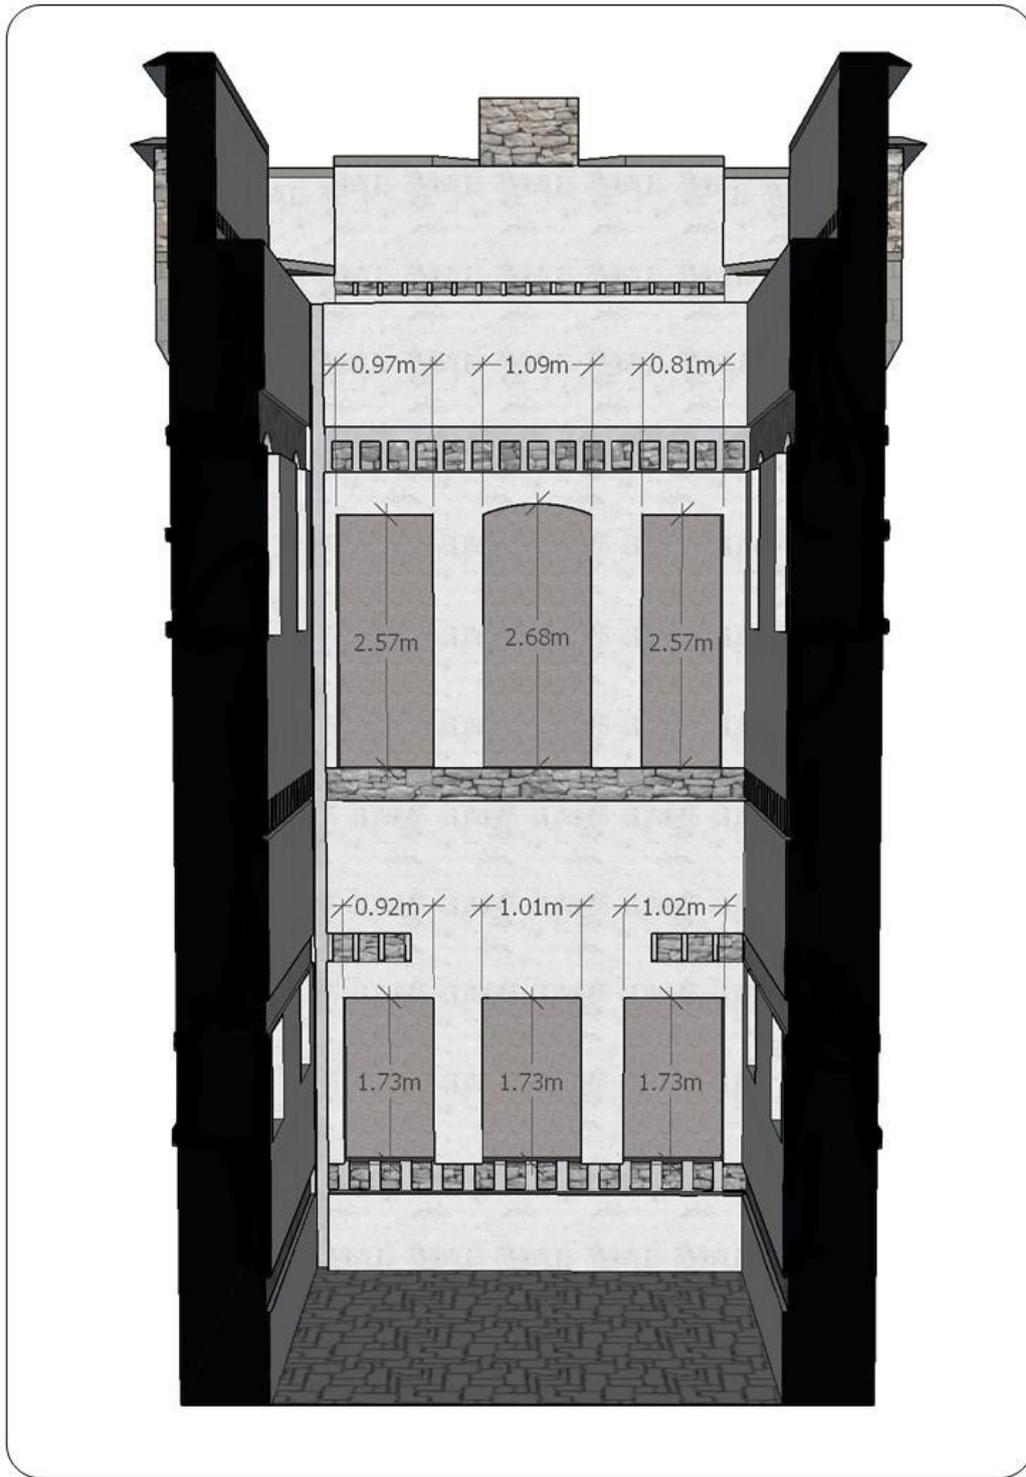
Cut away view of 3D model for an idealised tower showing interior face of rear wall with alcoves and fireplaces.
